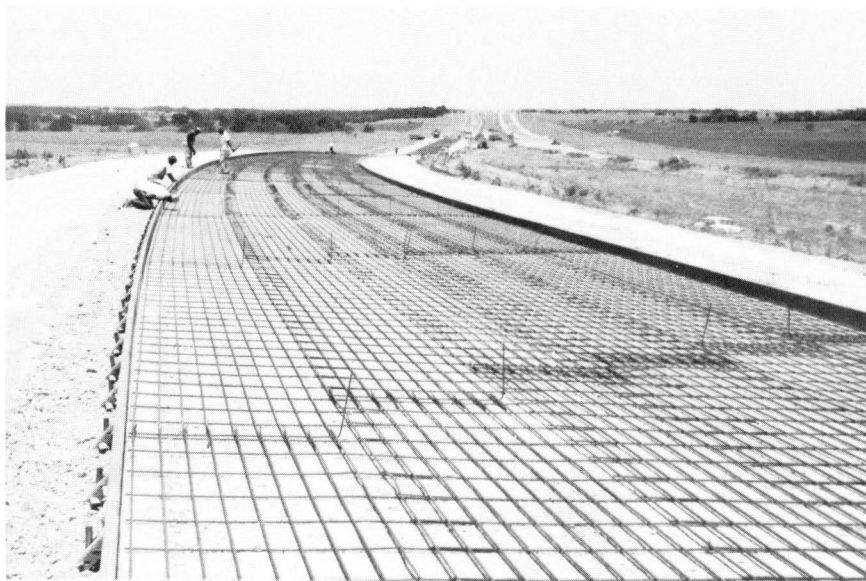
WELDED WIRE FABRIC WITH STAGGERED SPLICE PATTERN.
